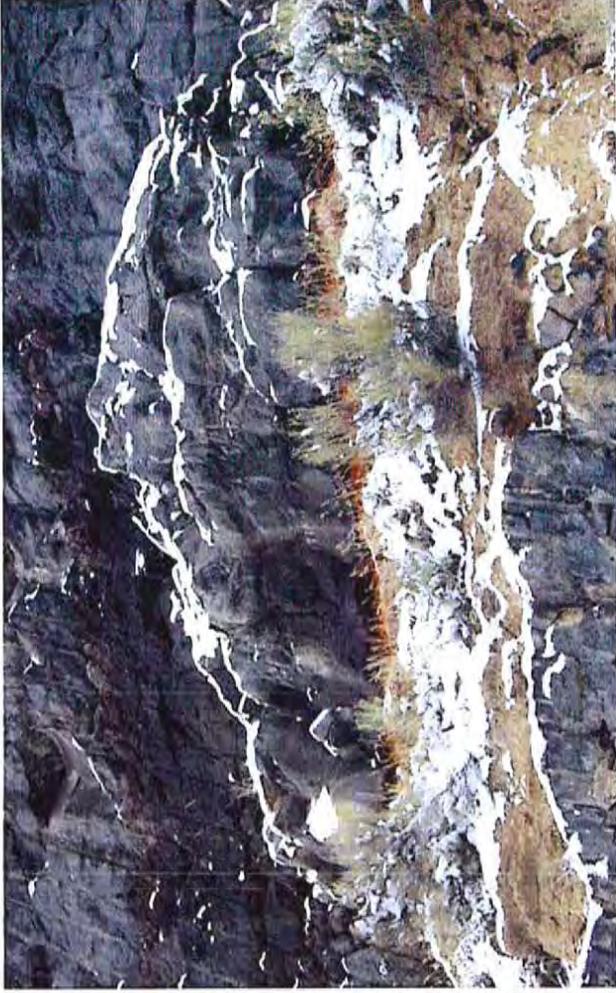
View of rock outcropping at STA 17+30 to 17+65
